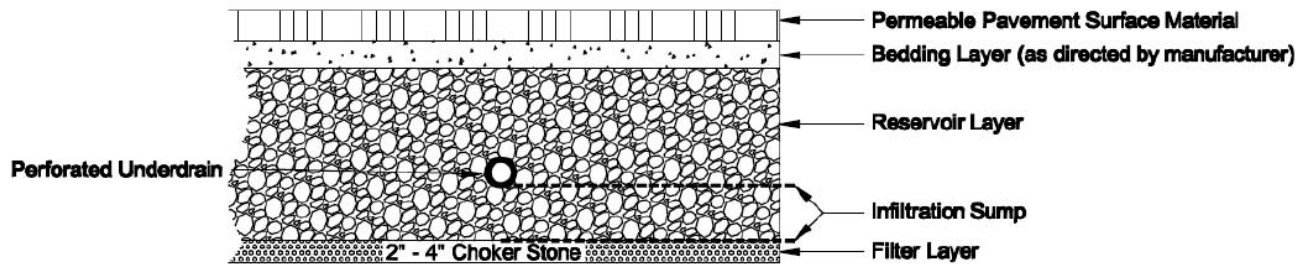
Cross Section of an Enhanced Permeable Pavement Design with an Underdrain.
